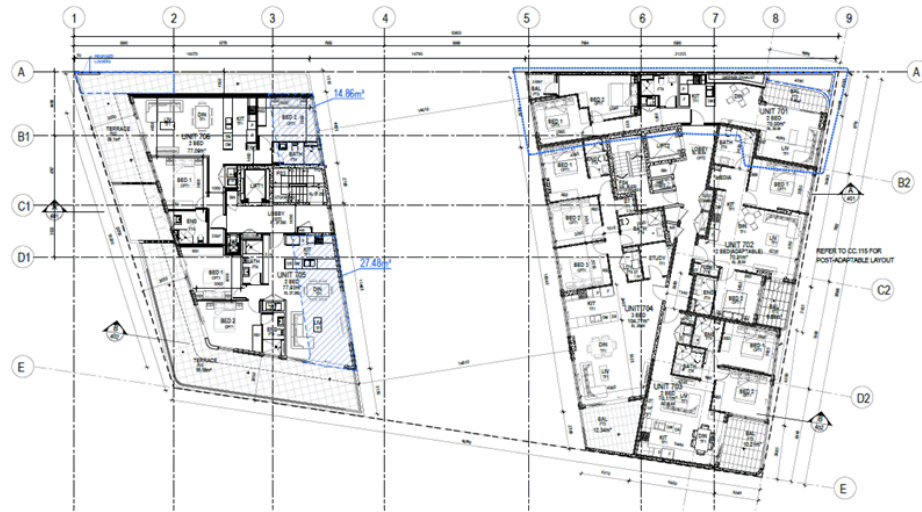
Proposed Level 7 changes (blue hatched area indicates additional floor space)
